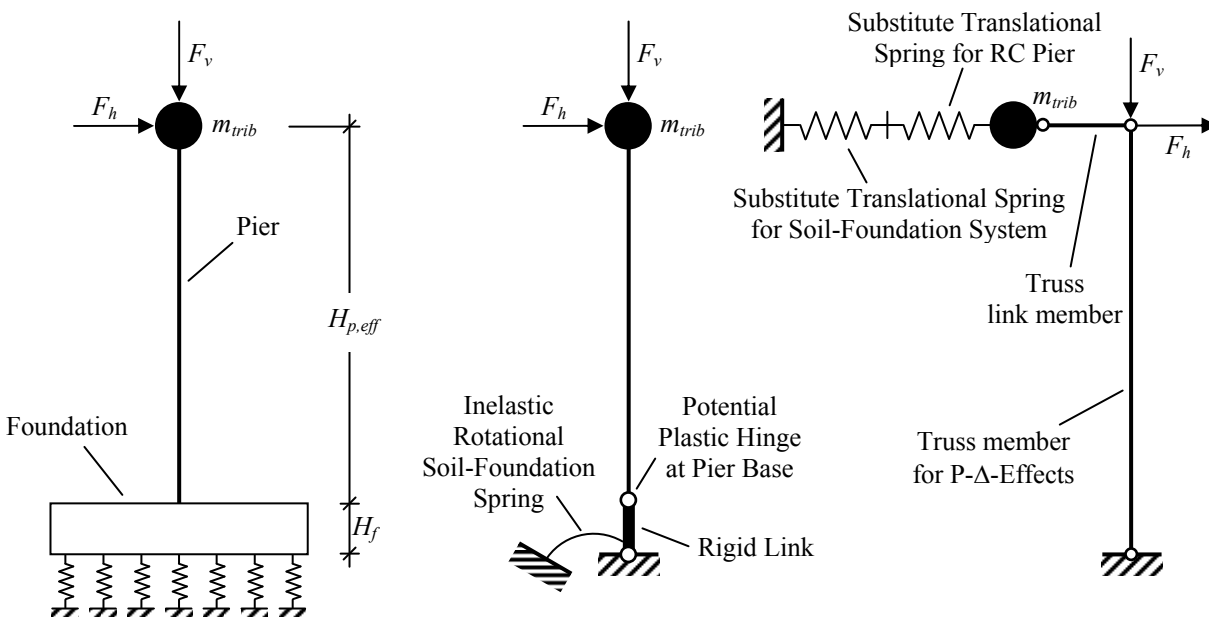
Modeling alternatives for single cantilever bridge pier taking soil-flexibility into account
